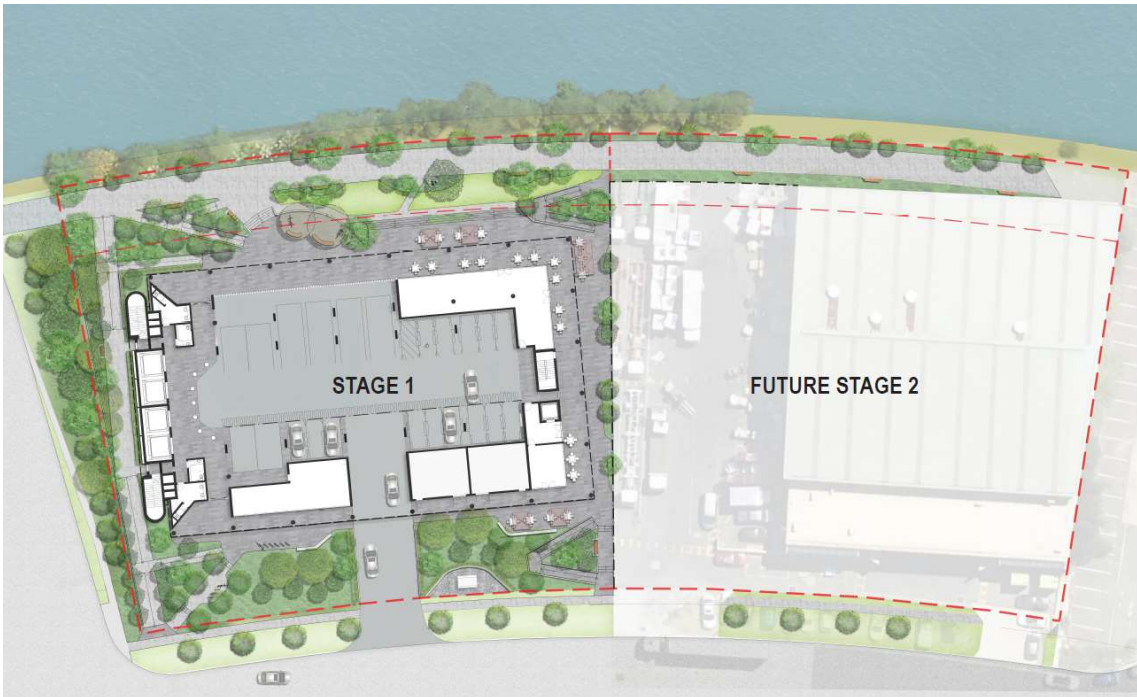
Stage 1 plan showing bicycle path works being completed wholly within the Stage 1
